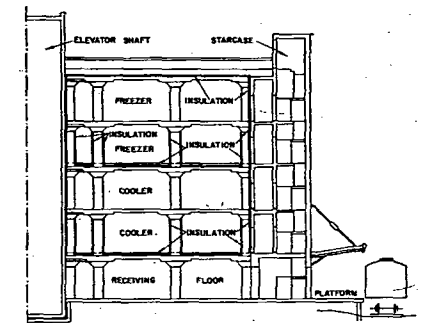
Section of Multi-Story Building with Curtain Wall Construction
